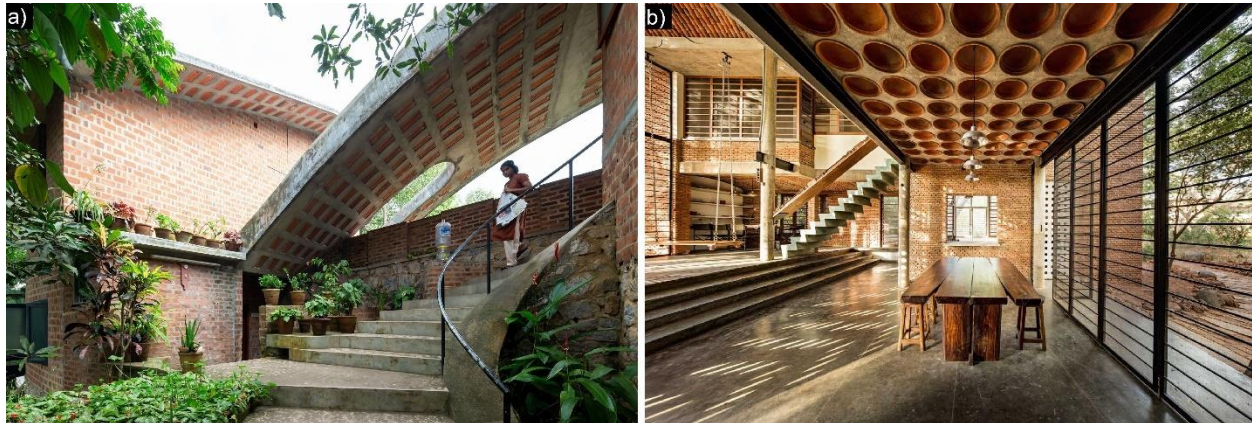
Acclaimed examples of Filler Slab construction in India. Structures highlighted include a) SEWA Building by Laurie Baker, Trivandrum, 2004 and b) Wall House by Anupama Kundoo, Auroville, 2000
